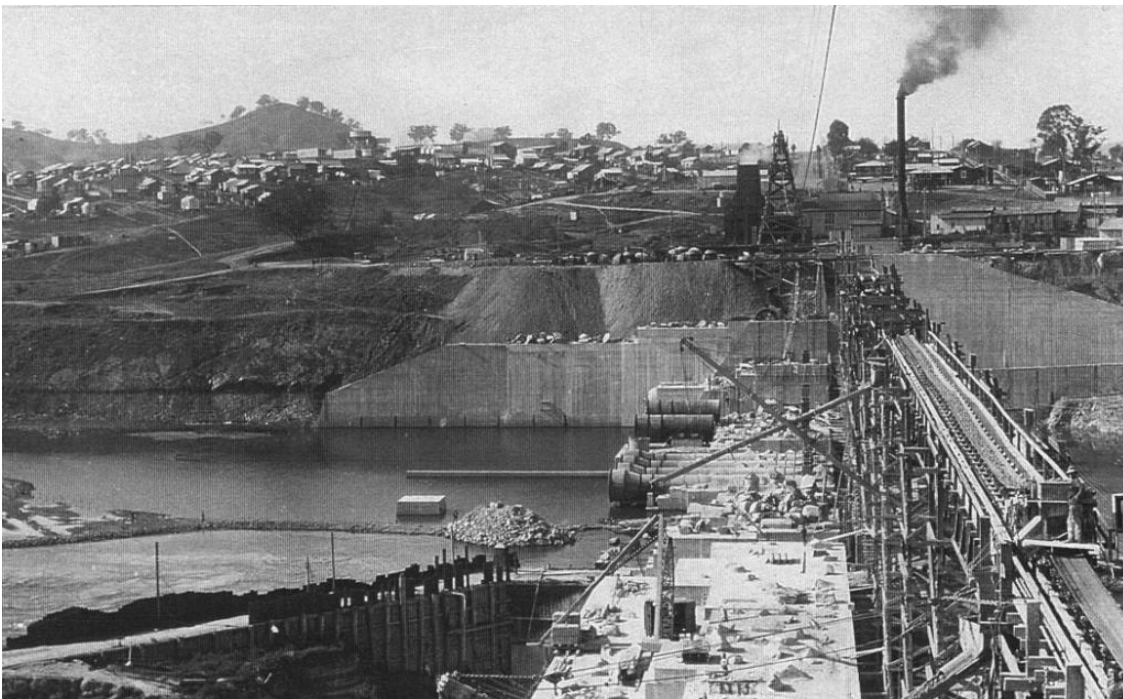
Historical photo taken during weir construction. Project area is centre and top left of frame
